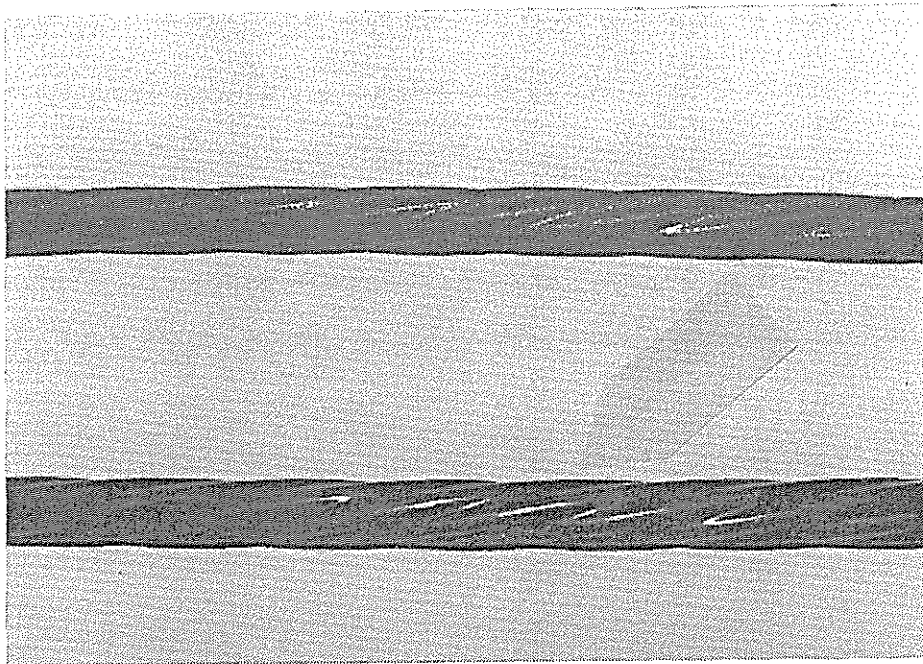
Two Coated Strand Sections with Arrow Pointing to "Gritless" Section
